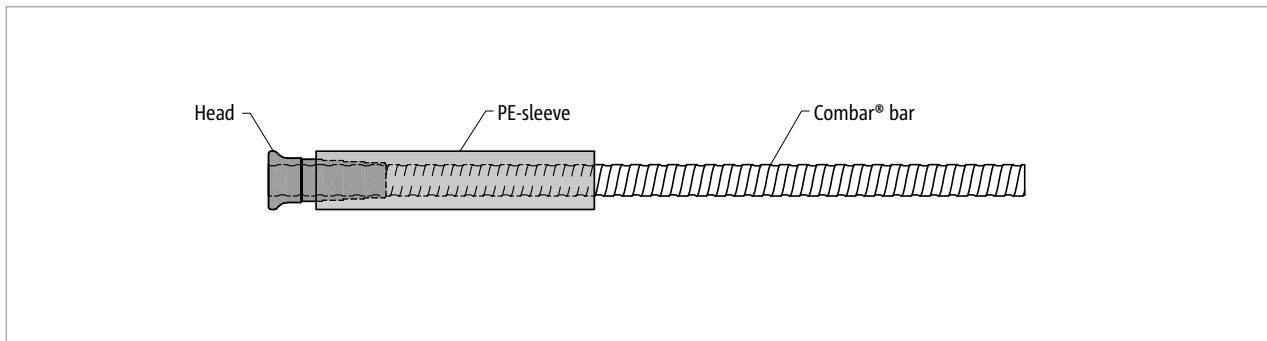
Schöck Combar® erection support for precast elements: Combar® single-headed bar with sleeve
